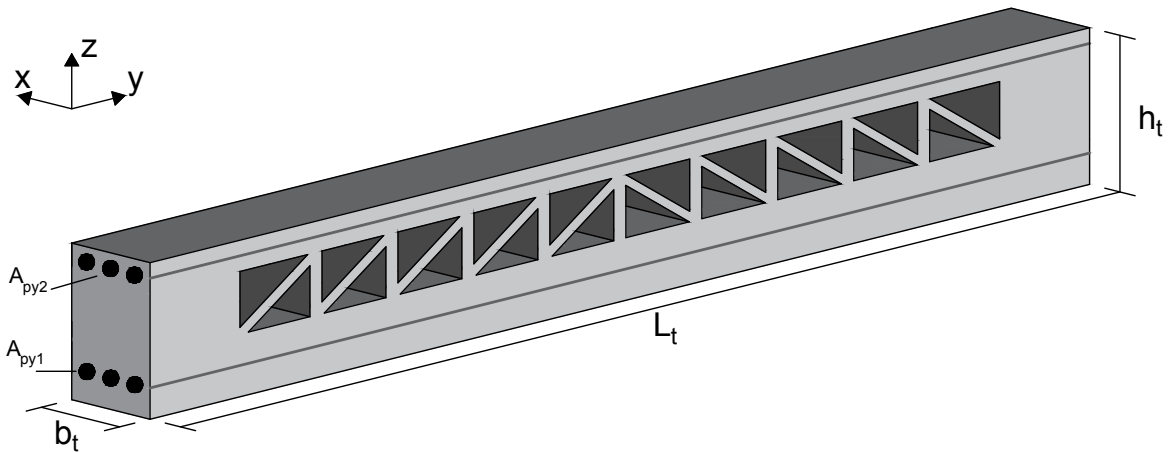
Truss girders with the prestressing cables indicated (not to scale)
